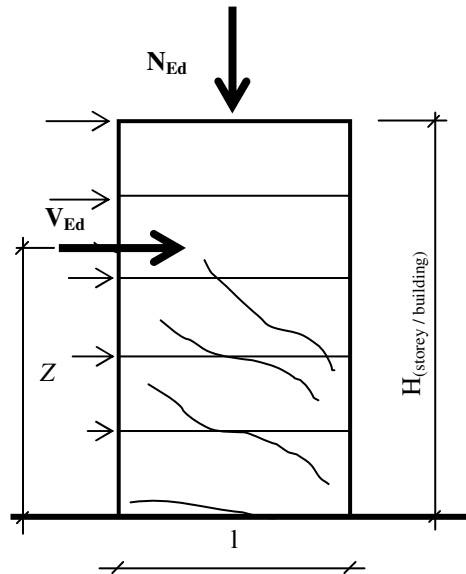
Masonry shear wall subjected to lateral in-plane forces and eccentric compression
